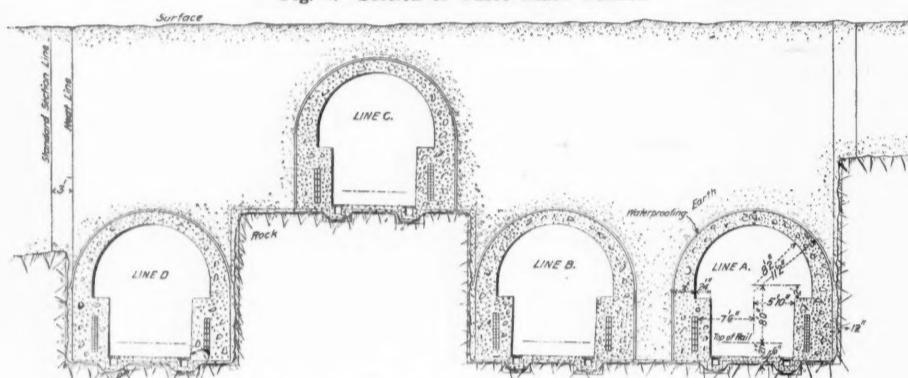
Section of Single Track Tunnels, Long Island City.
